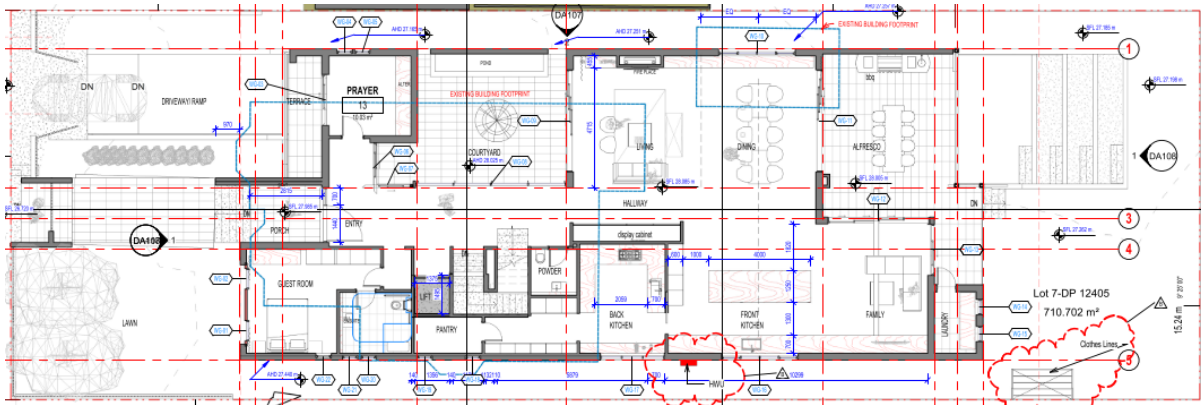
Extract of the proposed ground floor plan, drawing # DA104, revision B, dated 16/06/2021 (source: Licon Consulting).
